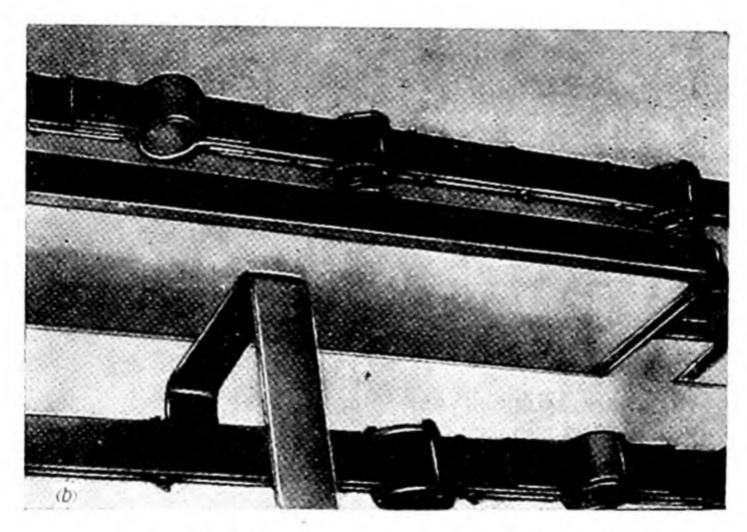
Bus expansion compensator mounting: a-buses ready for jointing compensator; b-compensators joined by welding
